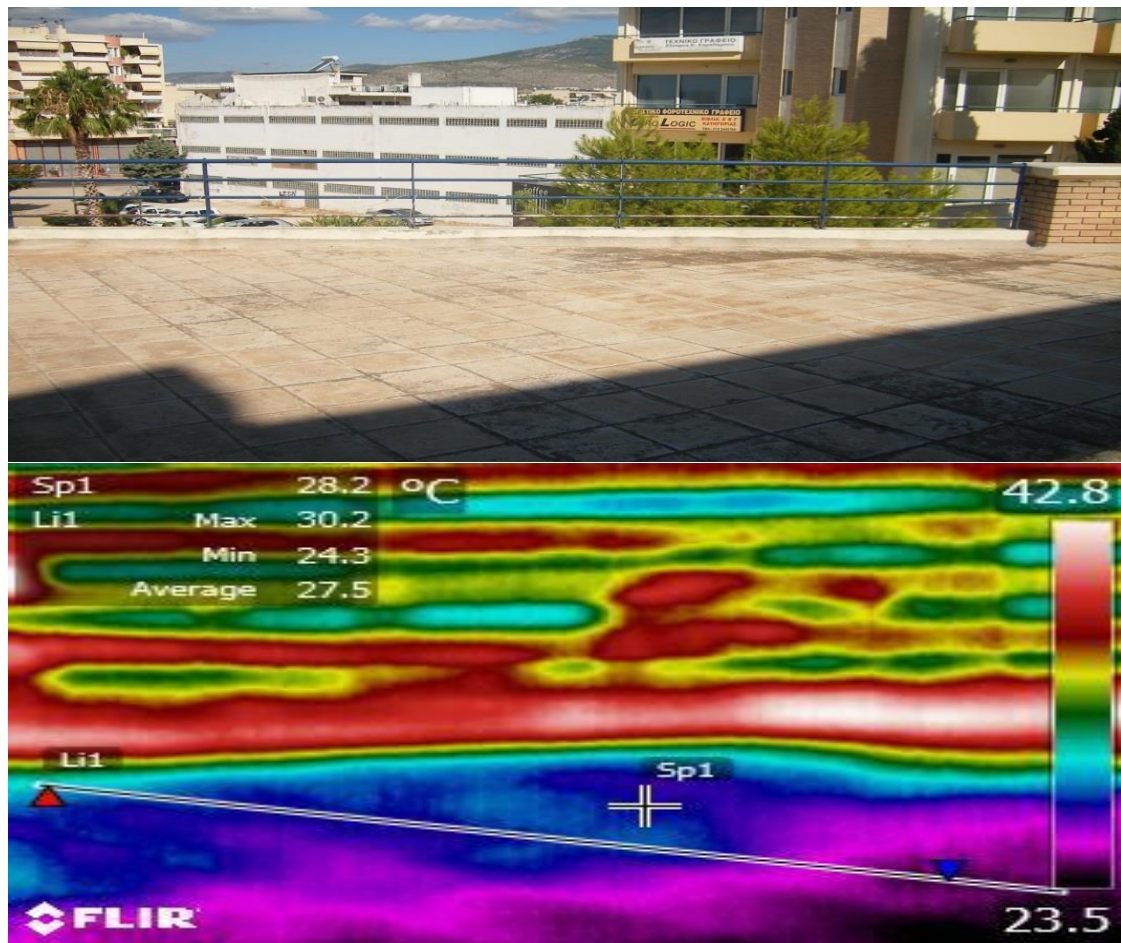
Thermal and visual photo of 2nd floor's roof tiles
